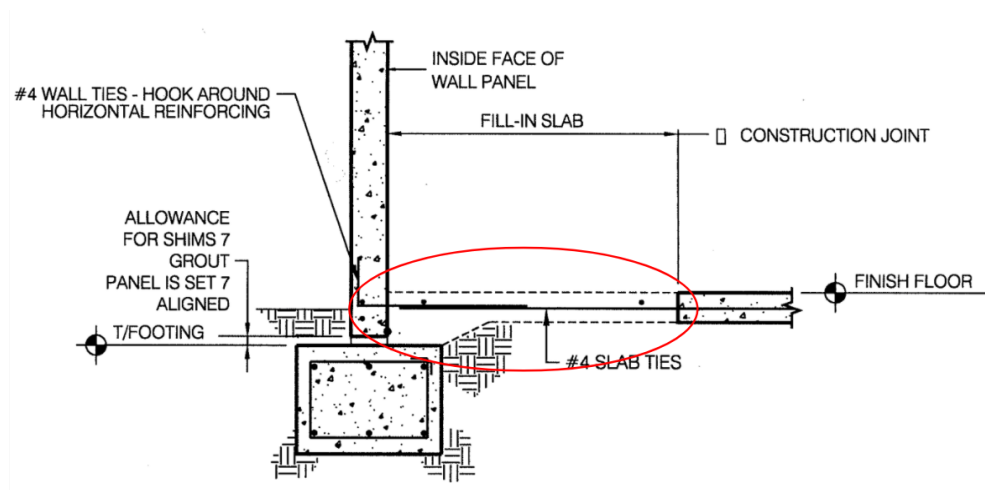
Typical Panel to Slab Connection Detail (Ward)
